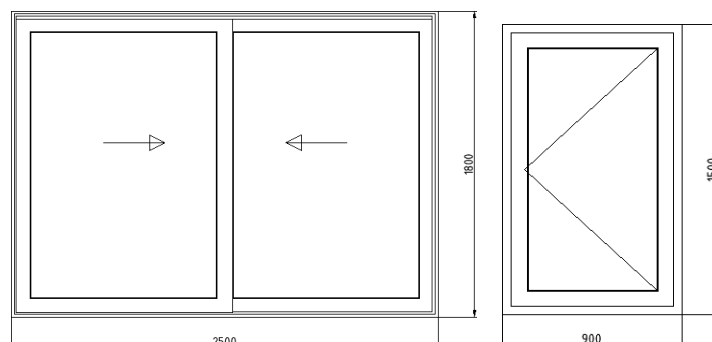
SYMBOLIC REPRESENTATION OF MEASURING DIMENSIONS
